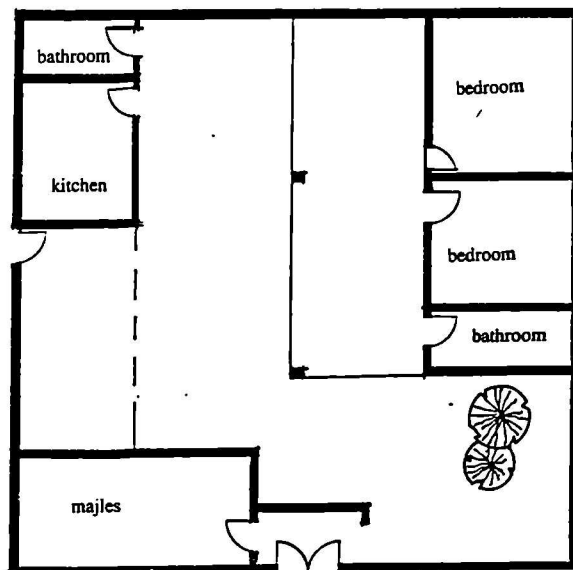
Plan of a traditional Arabic house built of cement-sand blocks
